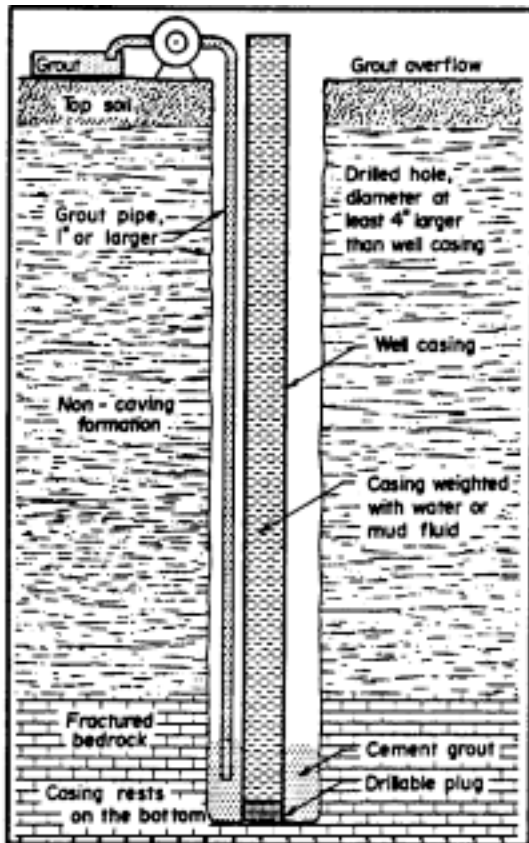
Grout Installation by Positive Placement Exterior Method. Grout is pumped through a pipe lowered into annular space outside the casing. (Johnson 1966)
